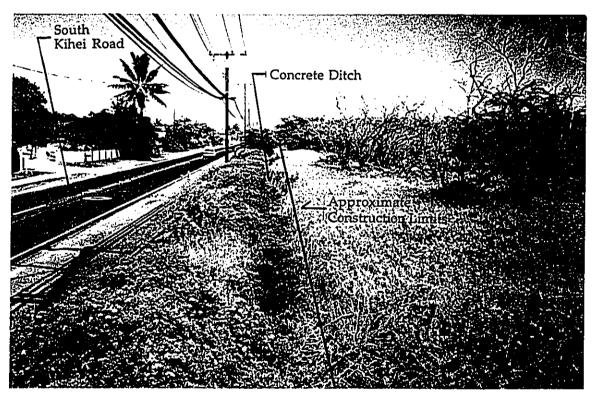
View South of Concrete Ditch near Intersection of Welakahao Road & South Kihei Road
